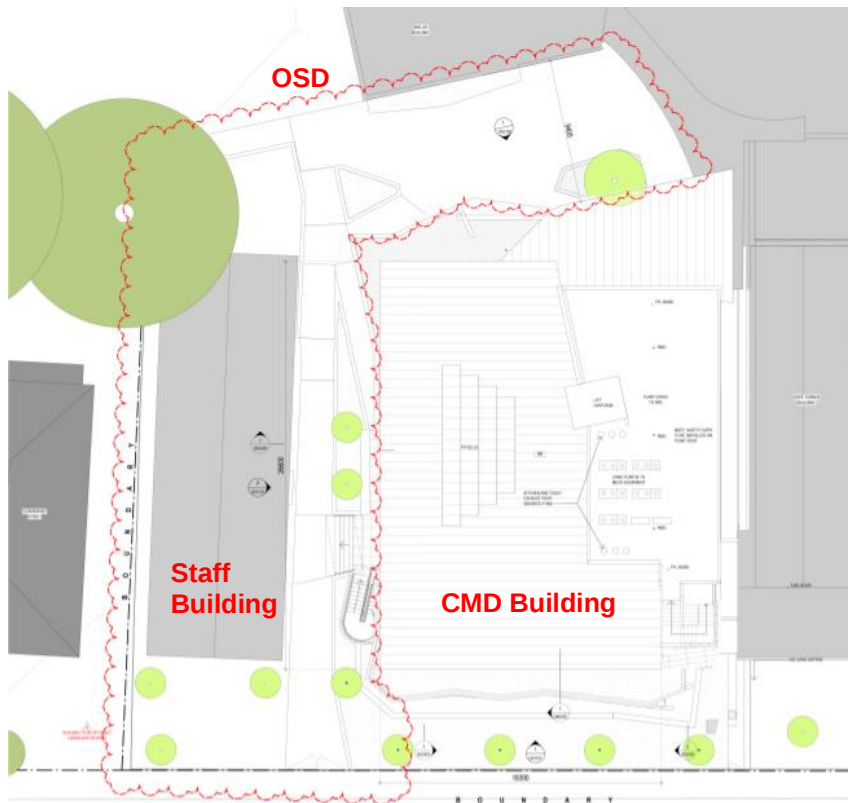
| Senior School Campus: CMD, retention of staff building, and landscape plans as requested in modification report (Source: Applicant's Mod Report 2020)
